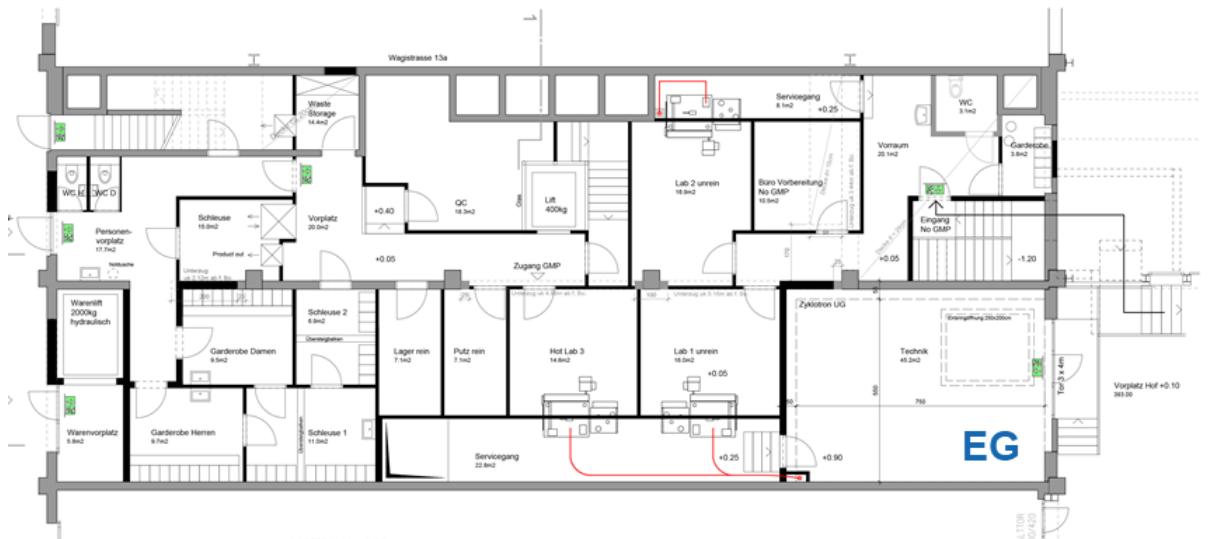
The floor plan of the new infrastructure at USZ Wagi campus in Schlieren.
